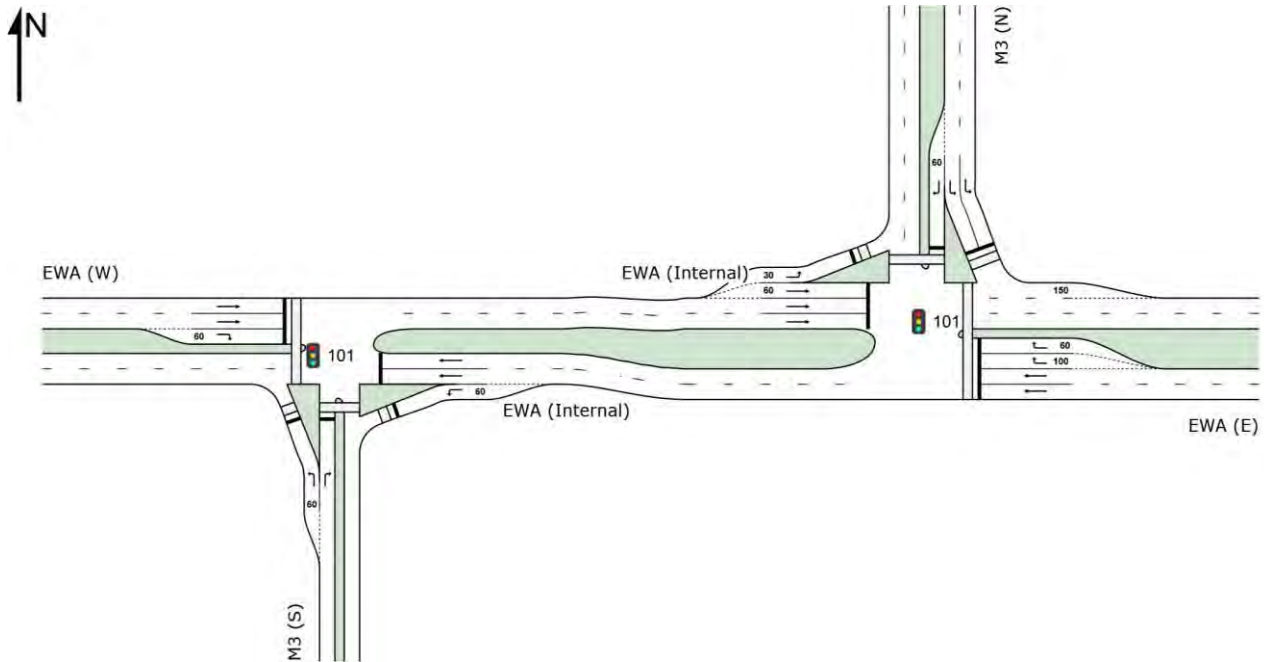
EWA-M3E Staggered-T Intersection Layout
